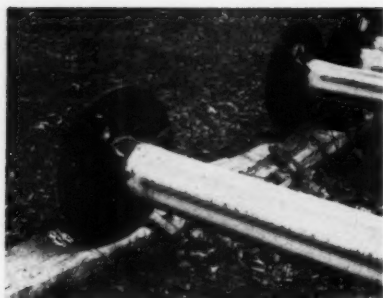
The lower end of the column showing the reinforced flange for fixing to the concrete base.
